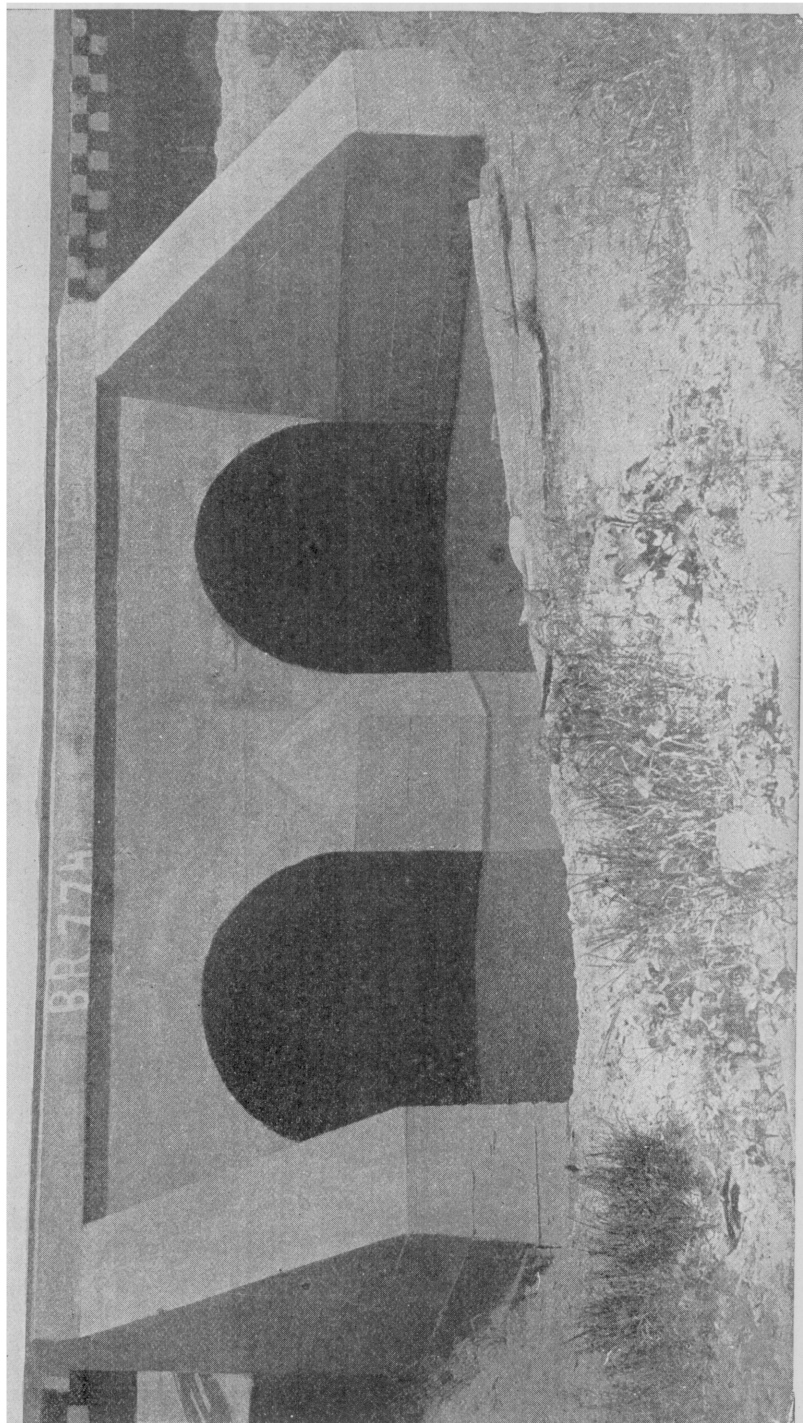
Double Six-Foot Culverts, Rankin, Ill.
